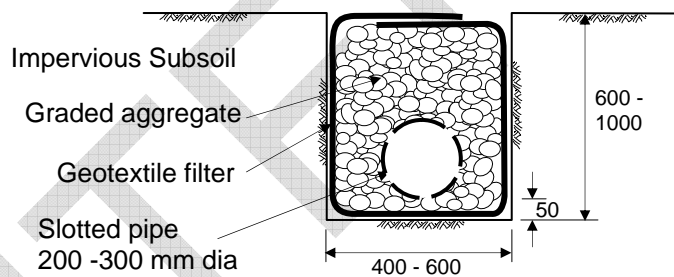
(a) - Cross-section of a typical pipe drain with aggregate and geotextile envelope. Used where the surrounding soil is impervious
